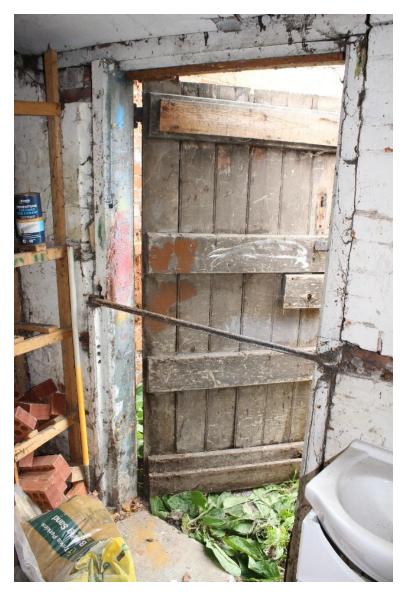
Internal view ESE of the kick-bar in the doorway of storage room
